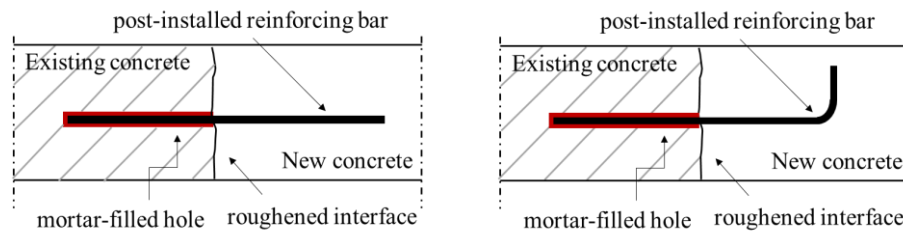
Post-installed reinforcing straight or hooked bar (typ.)
